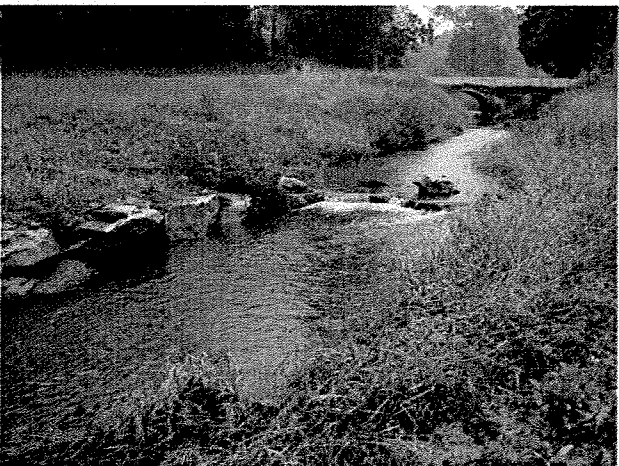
Upstream face of culvert installed at MS Station 33+00. (9/27/04)
